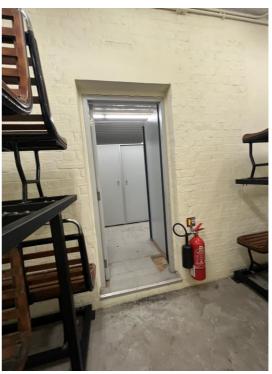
A door opening with traces of a concrete lintel at door head.
